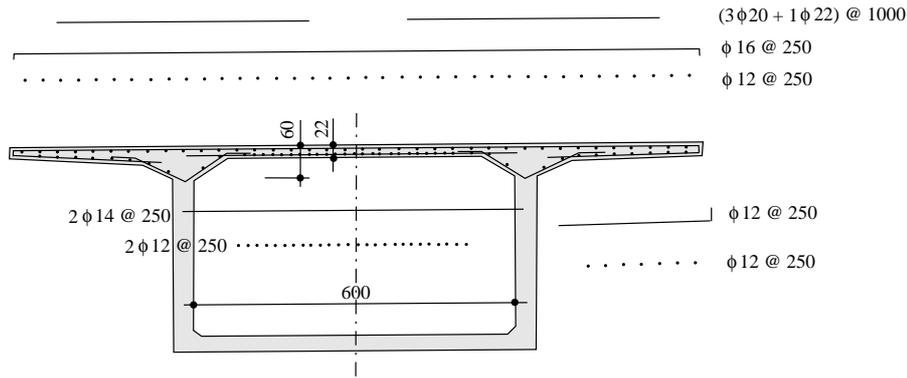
Cross section of investigated box-girder bridge (units in [mm])
